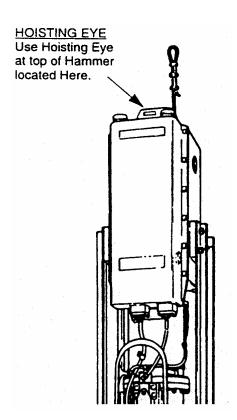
Use Hoist Eye On Top Of Hammer To Raise And Lower Hammer/Adapter/Driving Head Unit.
